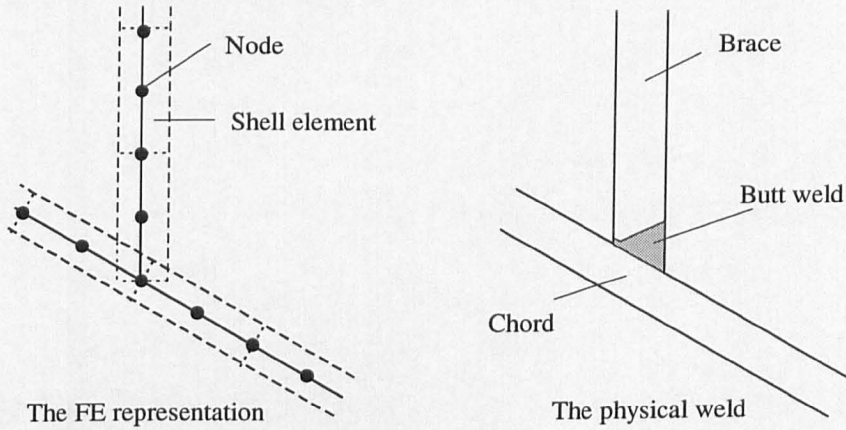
Example of the detail when a butt weld is assumed
